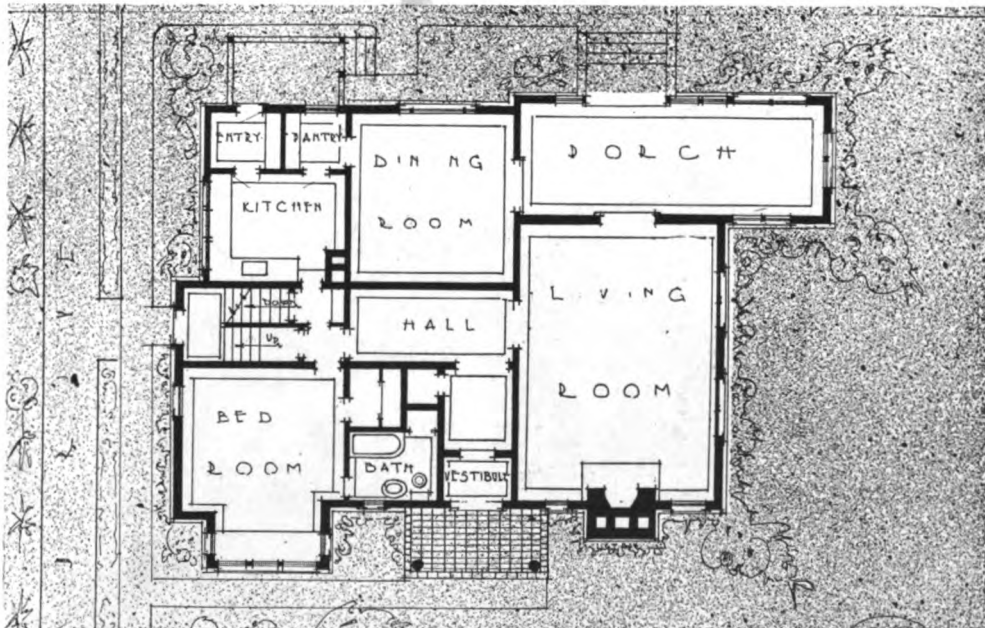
VIEW AND FIRST FLOOR PLAN—
